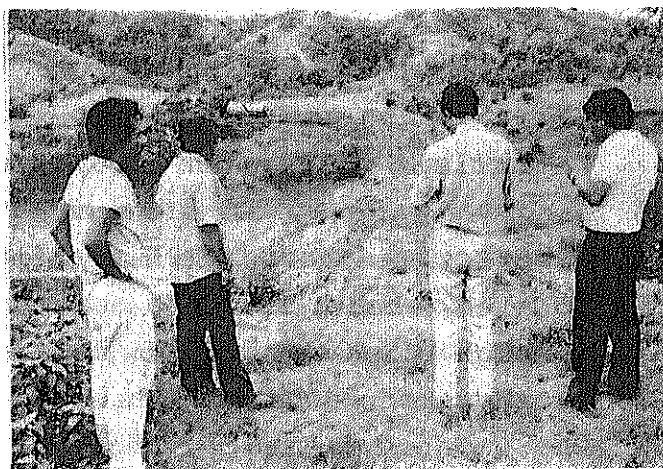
Damage to the Fuse Dike of the Masiway Dam
